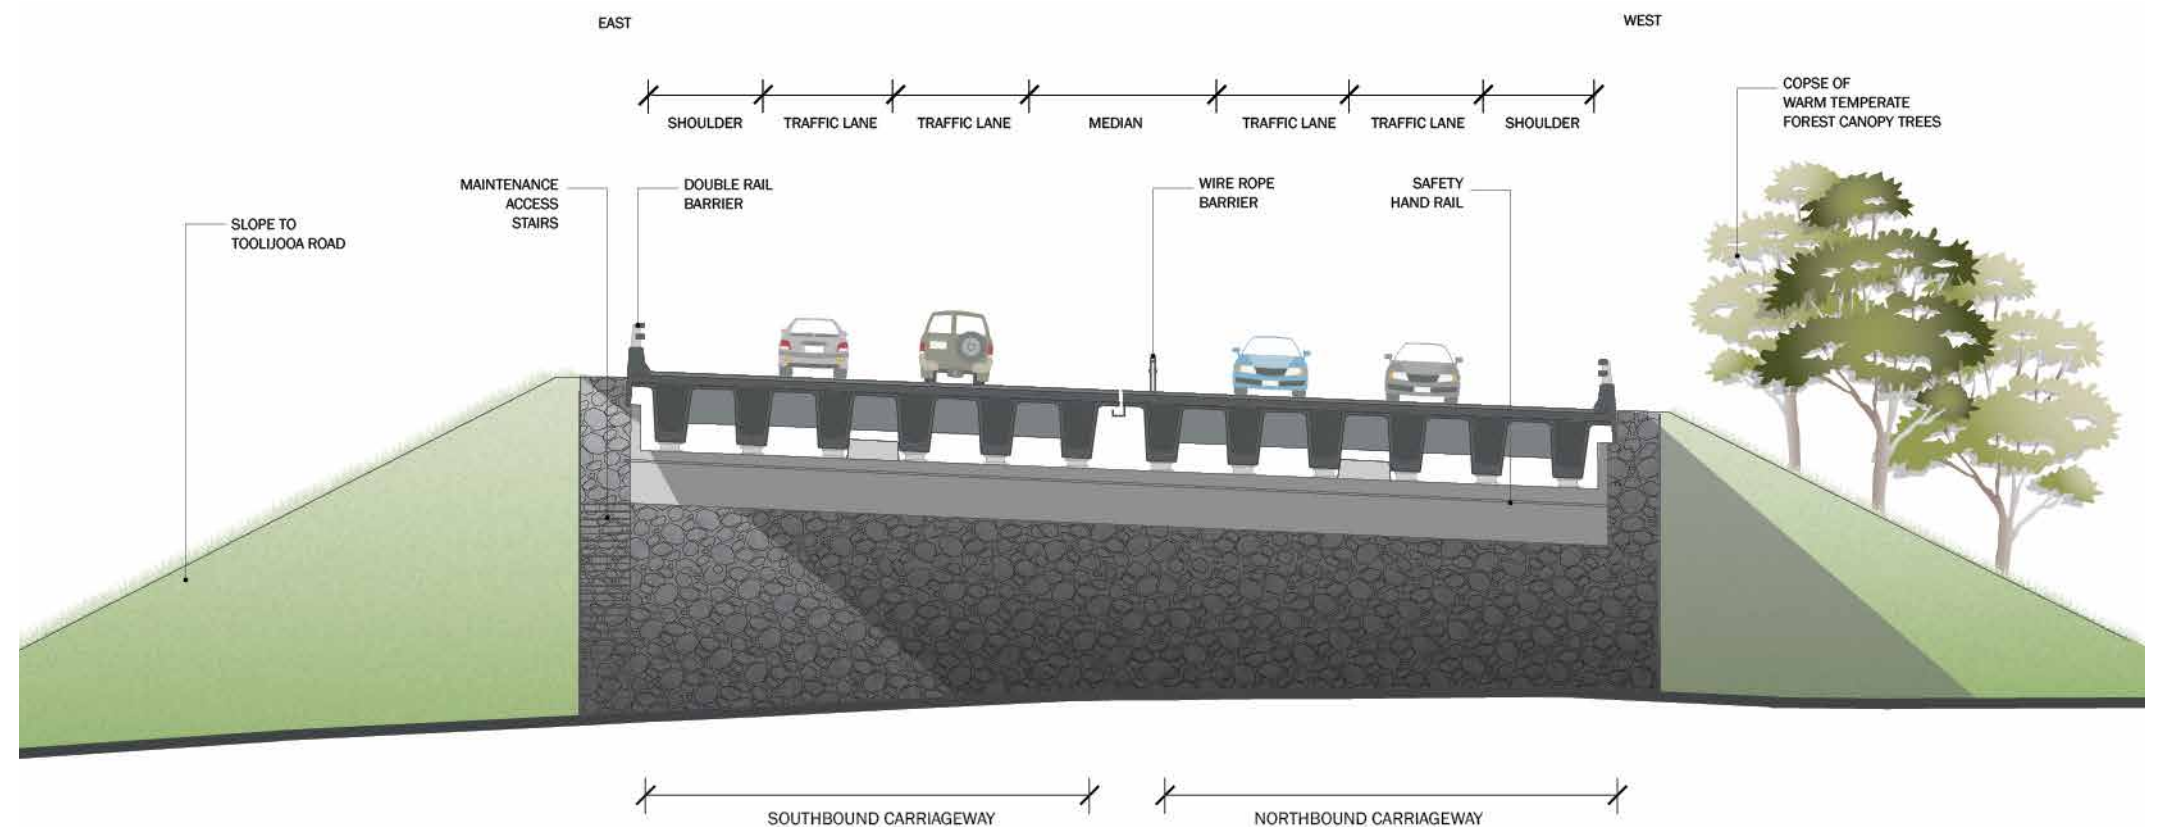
Section – Bridge SB01: Toolijooa Road Underpass (Scale: 1:200@A3)
